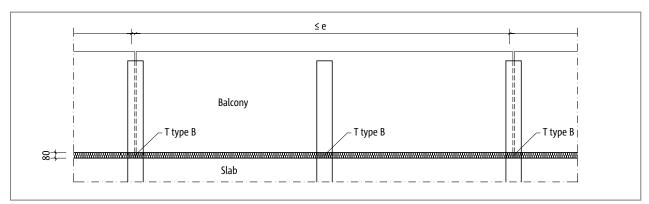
Schöck Isokorb® T type B: Expansion joint layout
